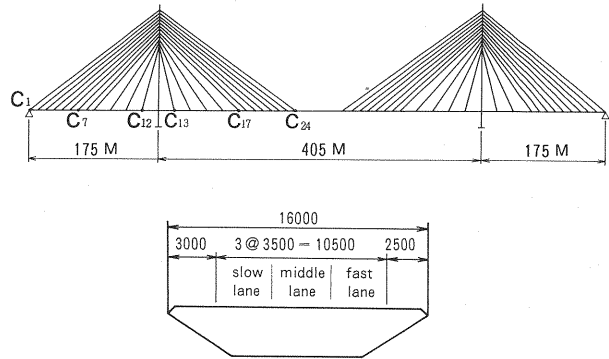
Layout and cross section of the model cable-stayed bridge.
